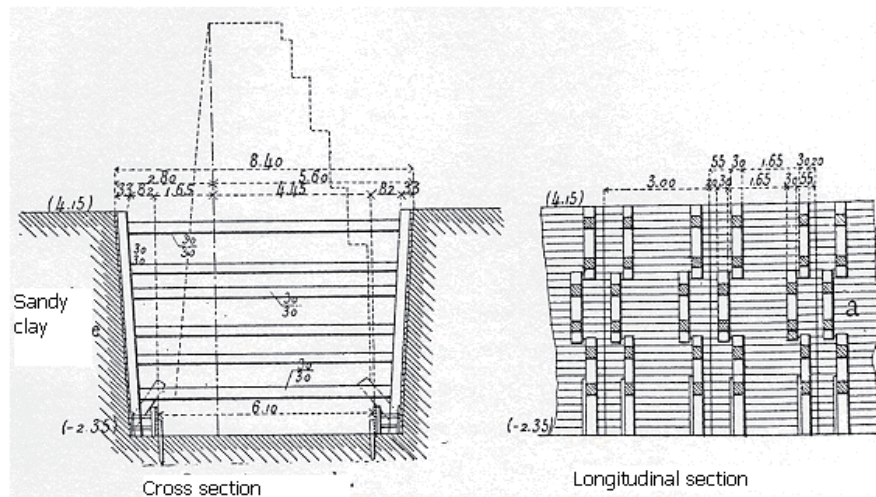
Cross and longitudinal sections showing strutted excavation 1890 [Rochemont et Desprez 1900]
